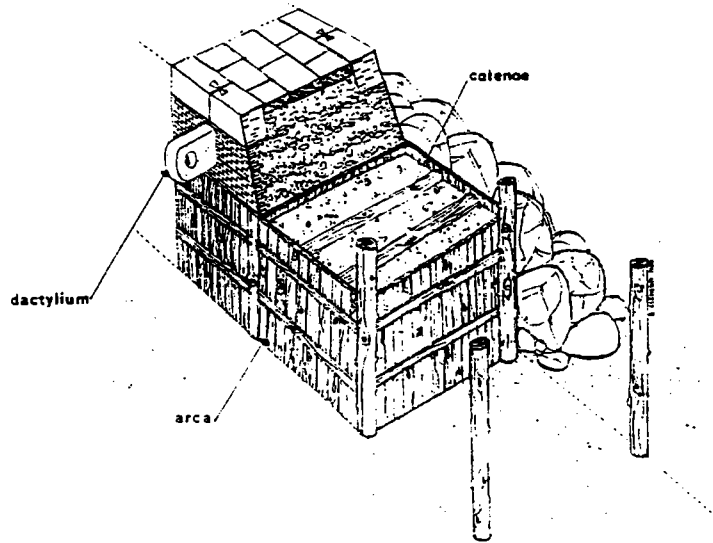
Reconstruction of the Roman construction system of a vertical breakwater with cast-in-situ concrete within wooden forms and tie-rods (Clementi)
